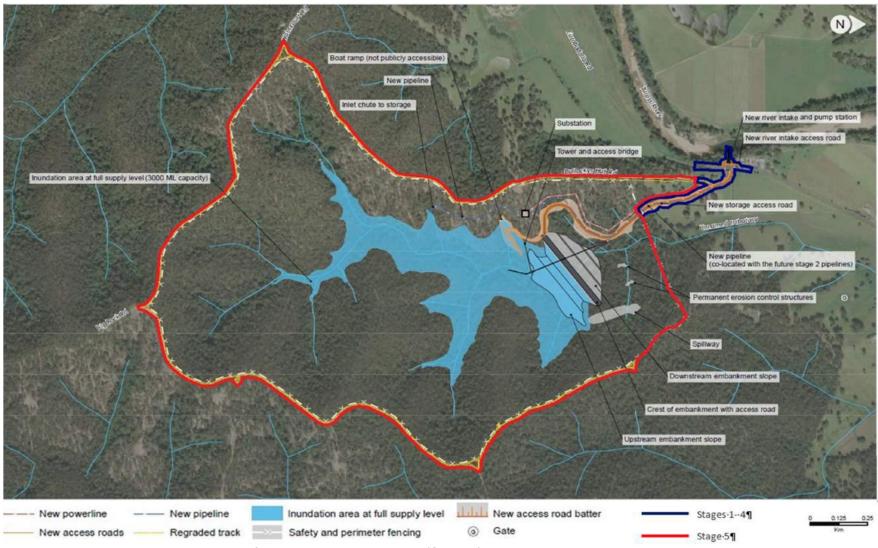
Project overview and scope of works covered by the plan (Stage 5)
